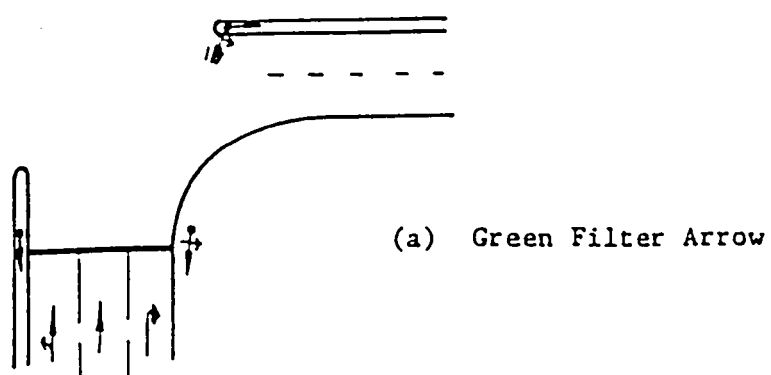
Alternative facilities for right turning traffic.
